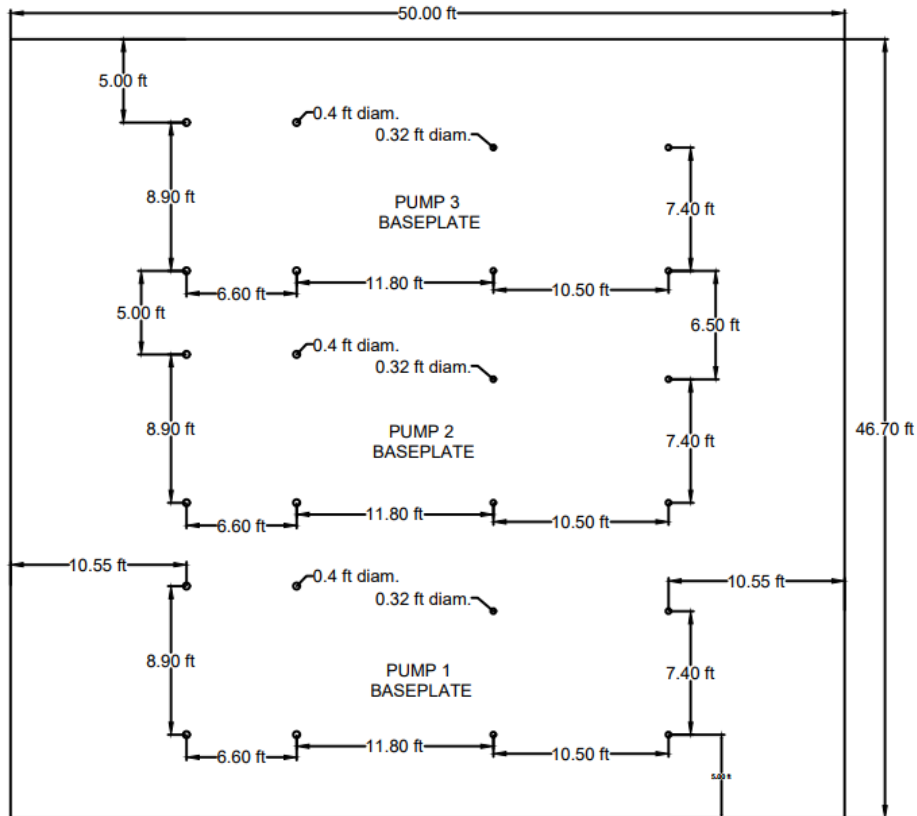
Layout of the base of the well pit in the pumphouse showing where bolted connections will be made to the floor
